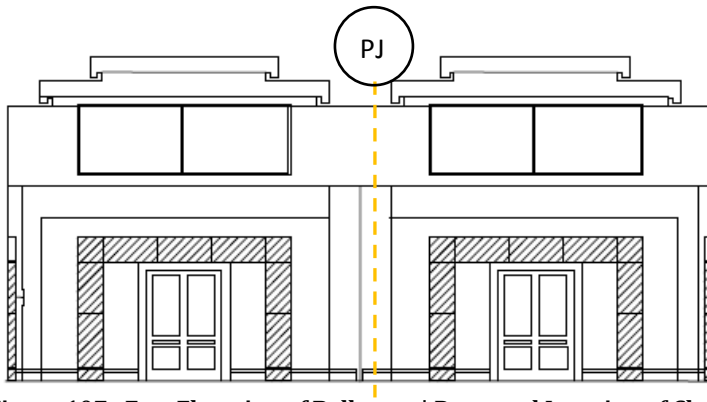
East Elevation of Ballroom | Proposed Location of Clerestories
